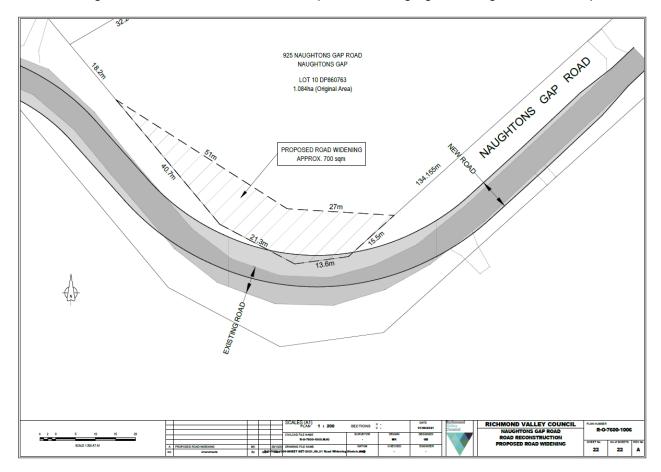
Road Widening Sketch showing approximate area of land acquisition required with road realignment.
